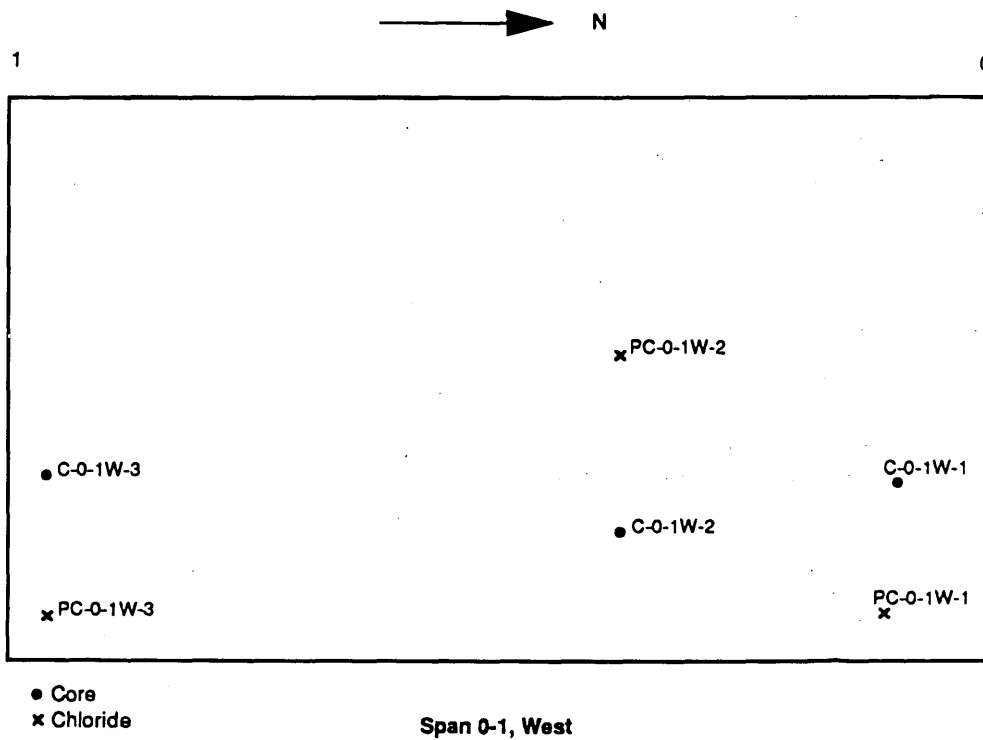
Core and chloride sampling, Bridge 7-40-6527, Span 0-1 west.
